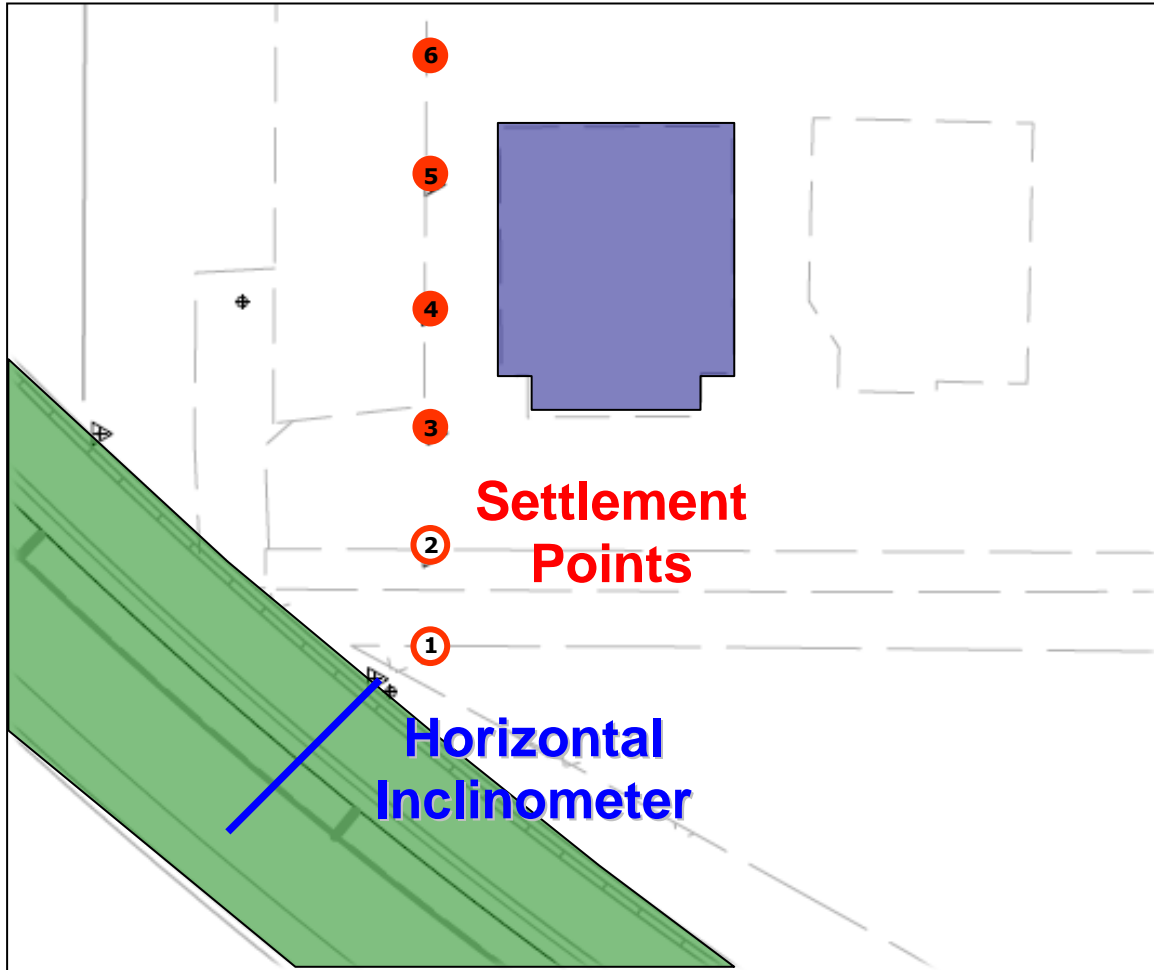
Instrumentation layout at the 200 South MSE wall.
